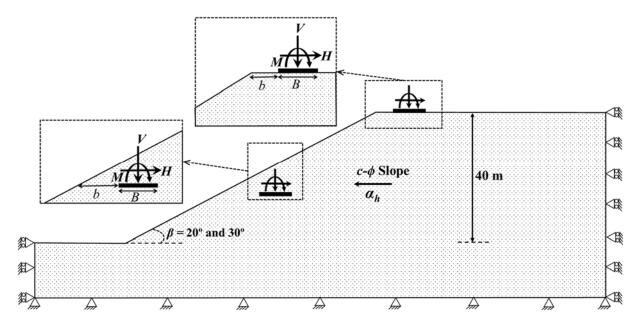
Schematic diagram showing typical strip foundation under general planer loading located on slope
